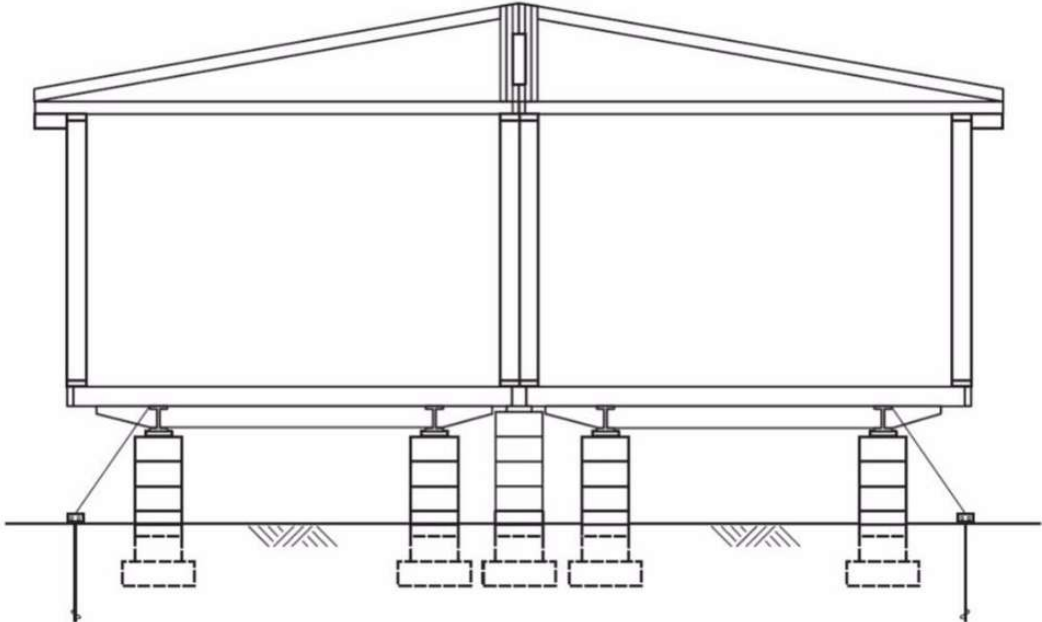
Example of a Manufactured Home placed on a non-permanent foundation.
